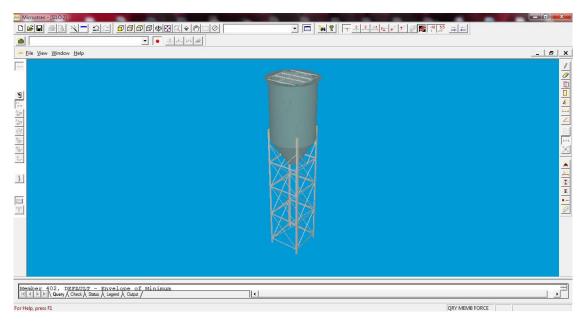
A perspective view of the silo structure that was developed following the site visit.
